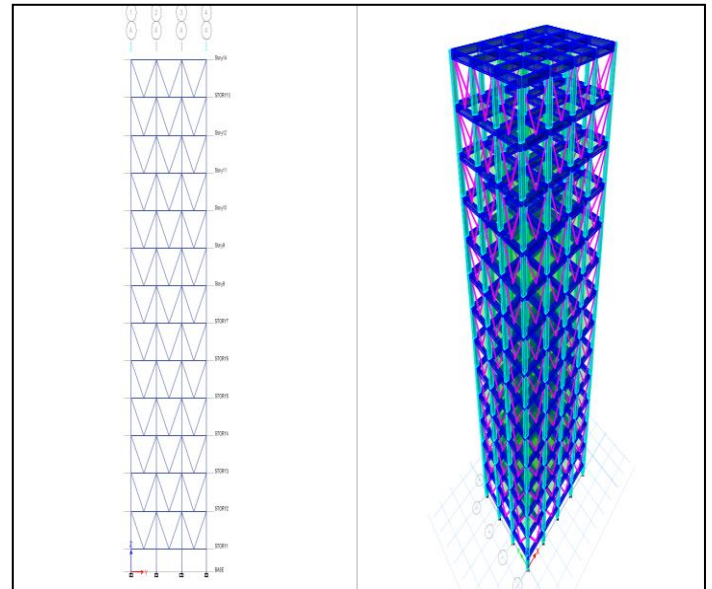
Elevation and 3D view of RC frame structure with V type bracing
